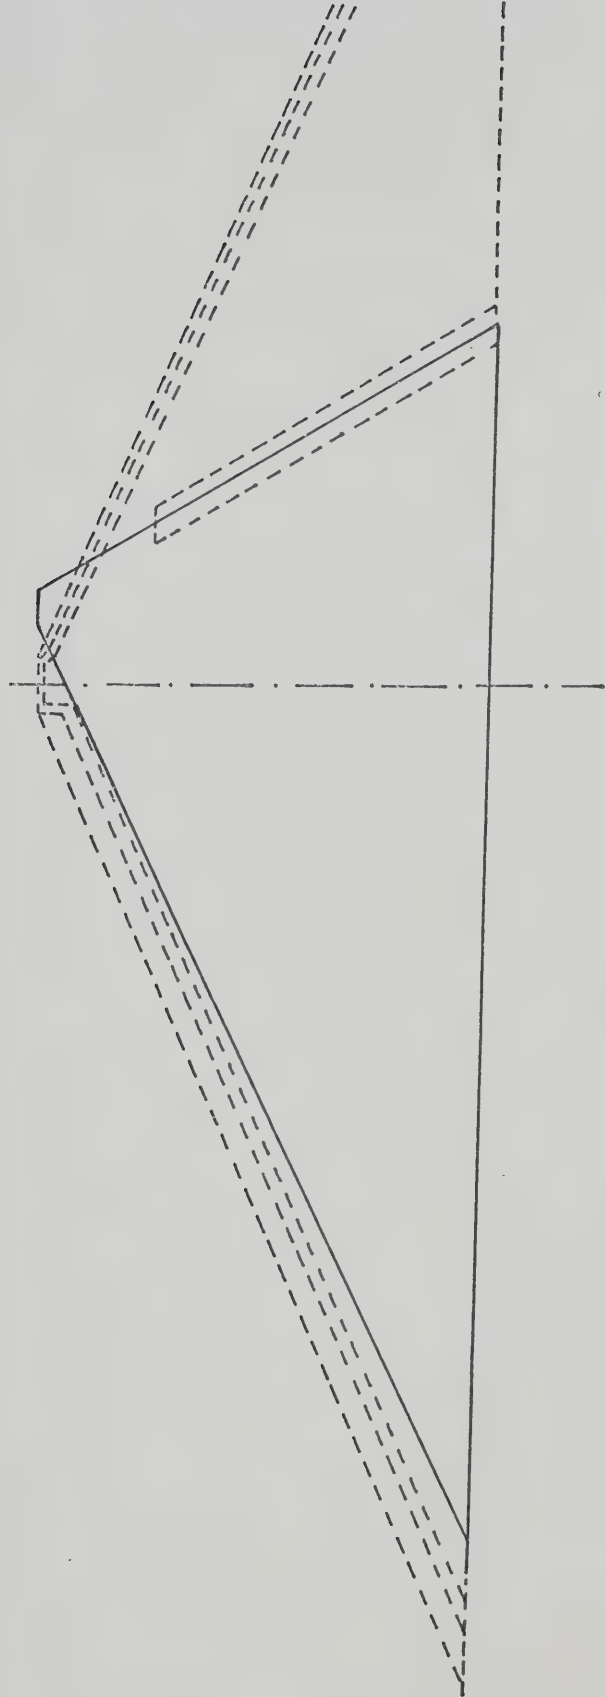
a ASSUMED CROSS-SECTION OF OTTER BROOK DAM
